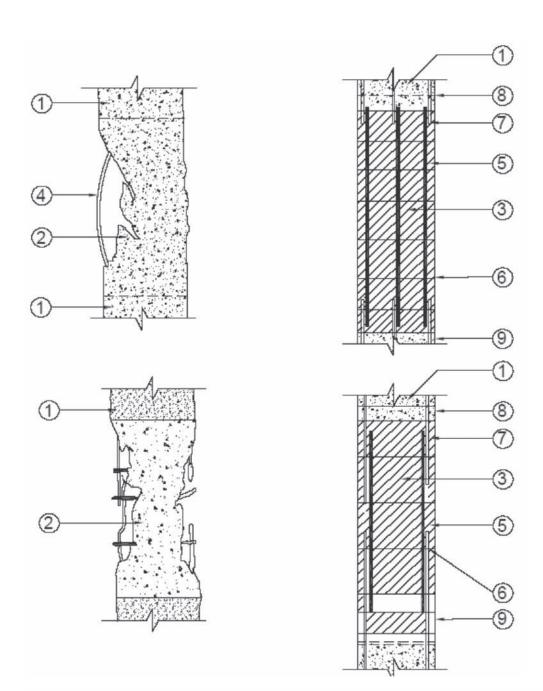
Repair of concrete columns with broken ties (1. Existing non-damaged concrete; 2. Existing damaged concrete; 3. New concrete; 4. Buckled reinforcement; 5. New reinforcement; 6. New ties; 7. Welding; 8. Existing ties; 9. Existing reinforcement)
